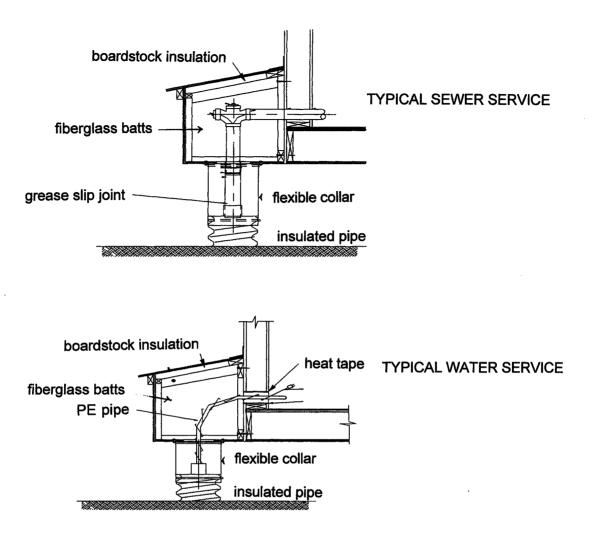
ARCTIC HOUSE UTILITY BOX INSTALLATION
